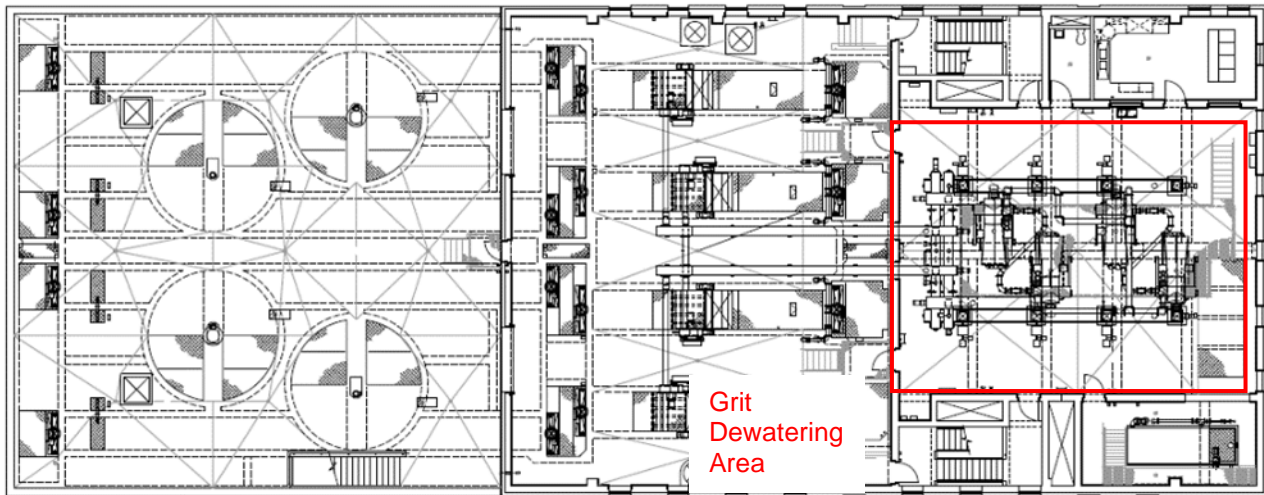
Existing Building K Plan with Grit Dewatering Area Highlighted
